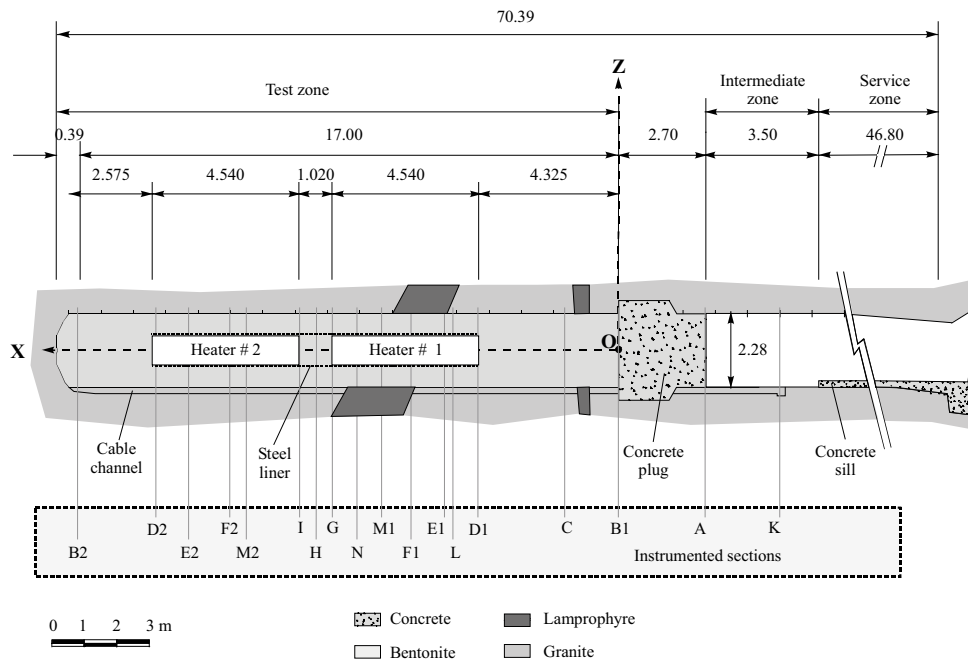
Instrumented sections in the engineered barrier(ENRESA 2006a).
